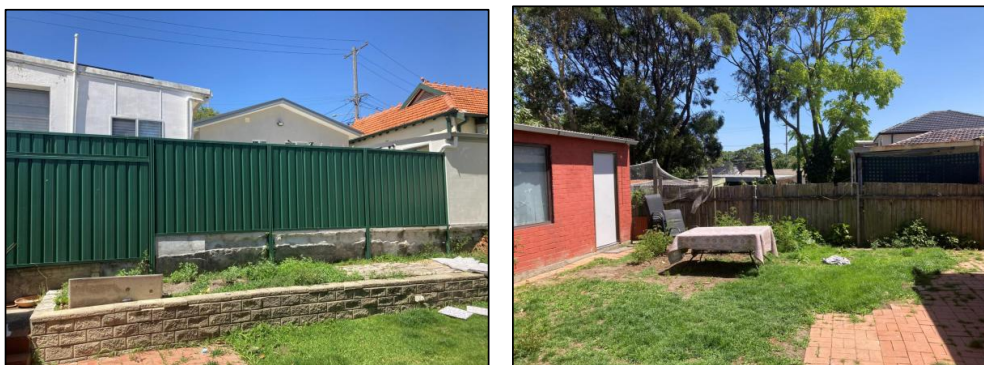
& 9. View of boundary fencing facing No. 11 Union Street (left), and No. 7 Union Street (right).
